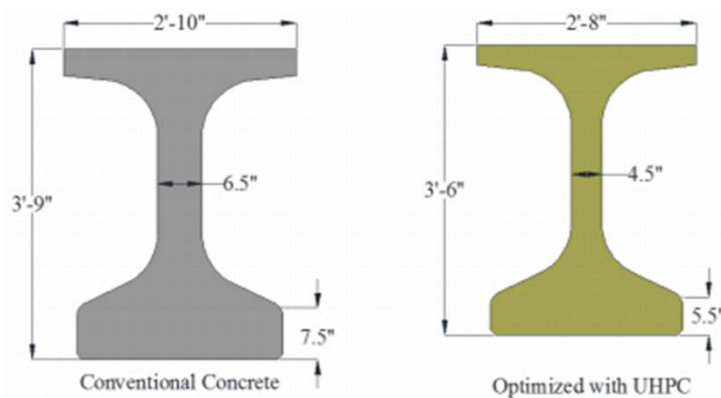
UHPC precast girder vs. conventional concrete precast girder [9]
